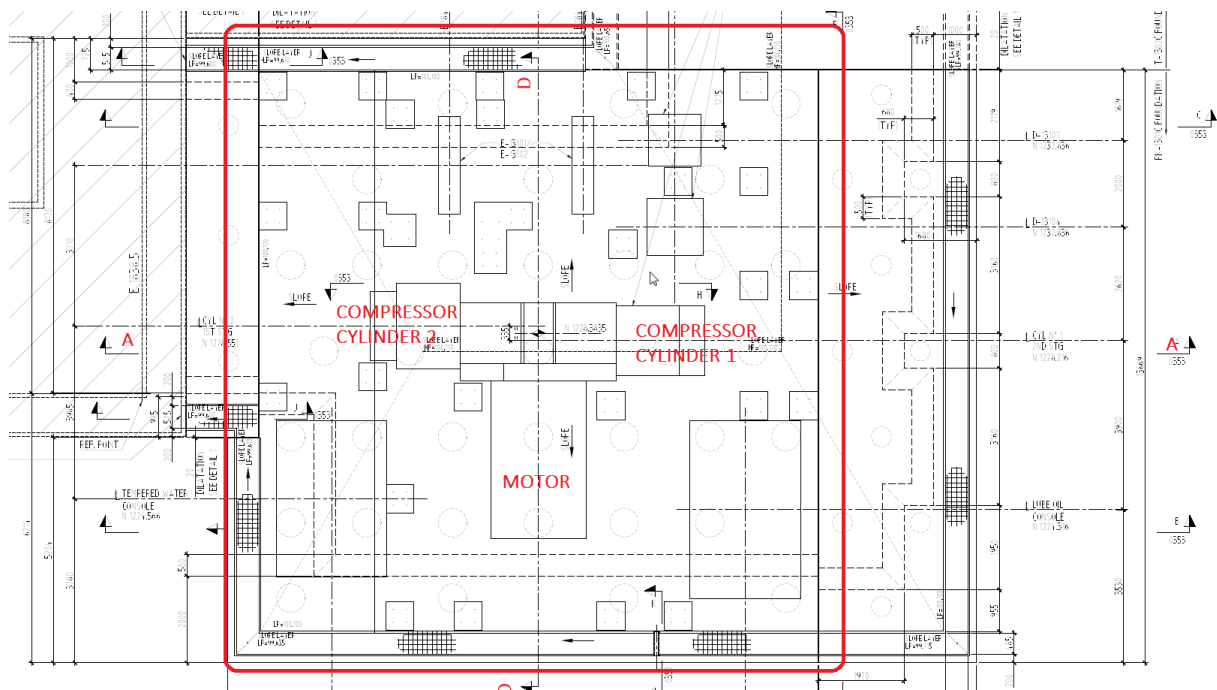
Planview – Geometry definition of pile cap and equipment plinths
